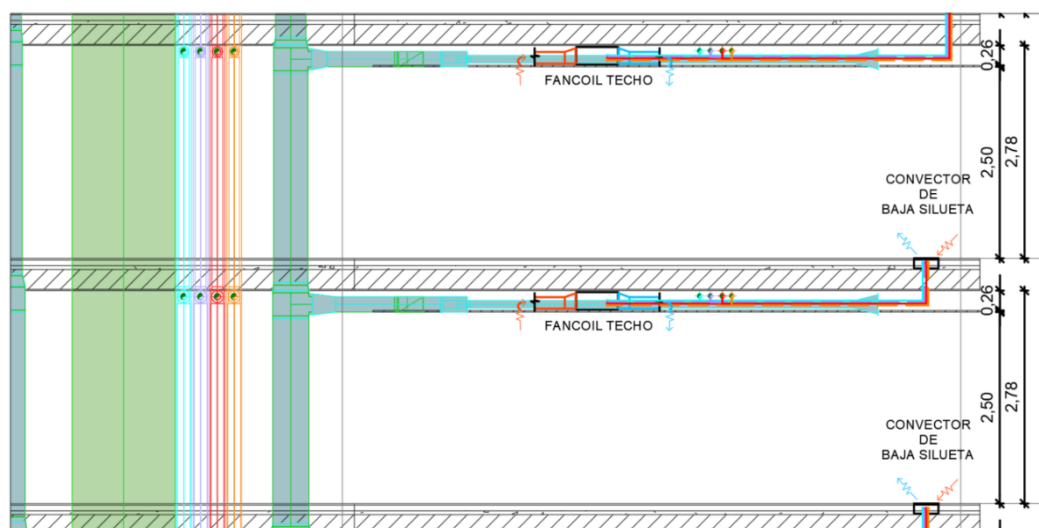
Plan section of standard plan, alternative 2 (source: AIGUASOL).
